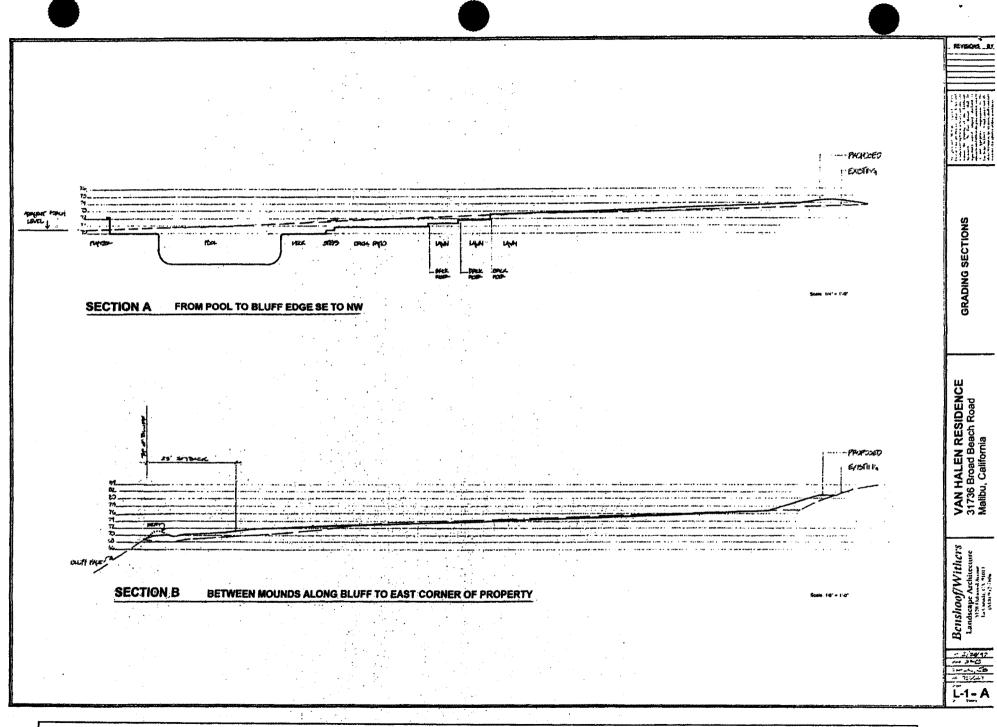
(4-95-049-A1) Cross Section of Proposed Grading
